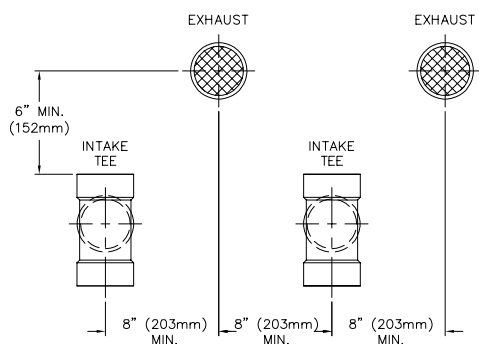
Vent Pipe Spacing for Multiple PureFire® Boilers
